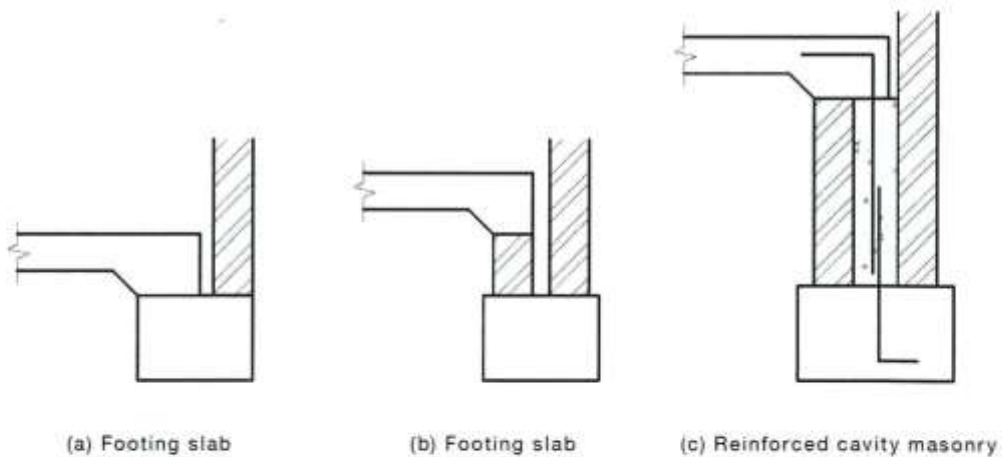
EXAMPLES OF FOOTING SYSTEMS REQUIRING JOINT TREATMENTS
